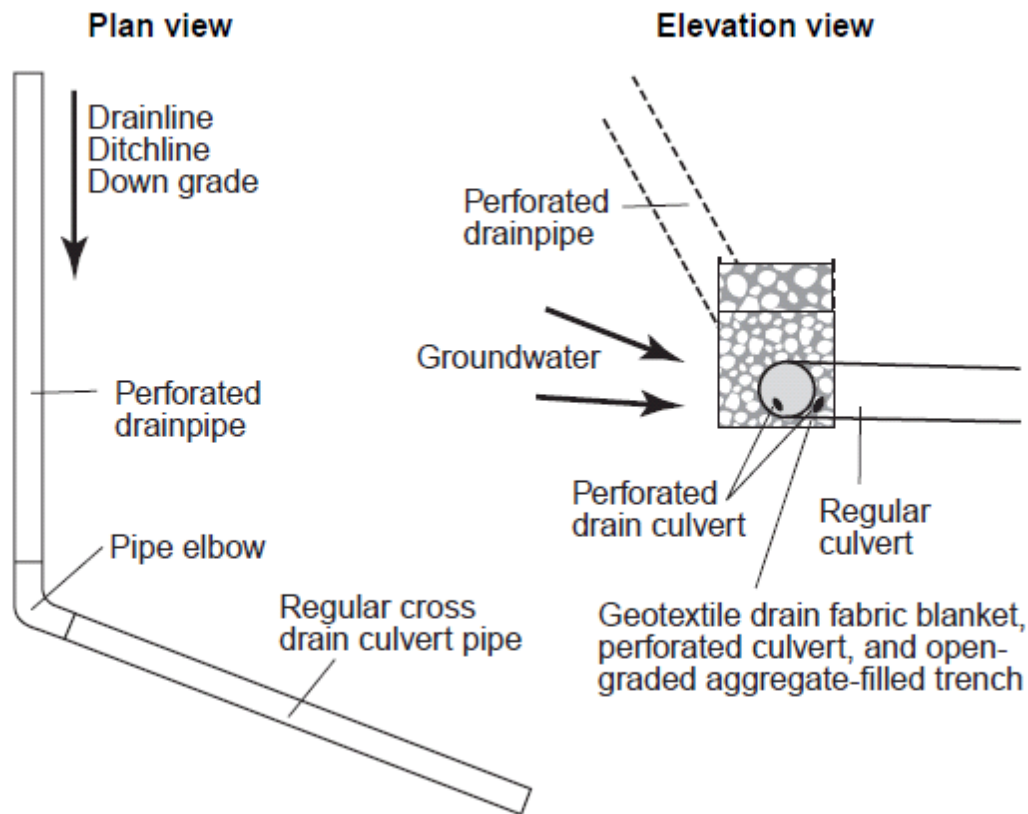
Under-drain used to cut off ground before it steepens in to the sub- grade.
